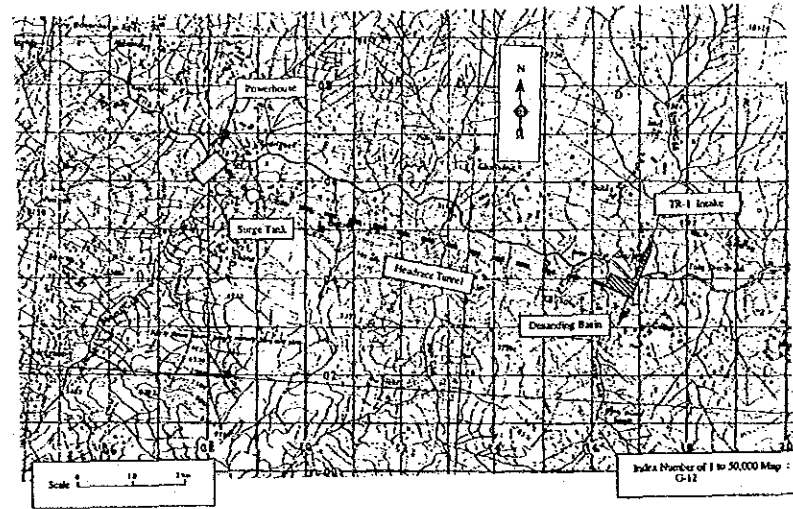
Preliminary Plan of LR-1 Scheme
